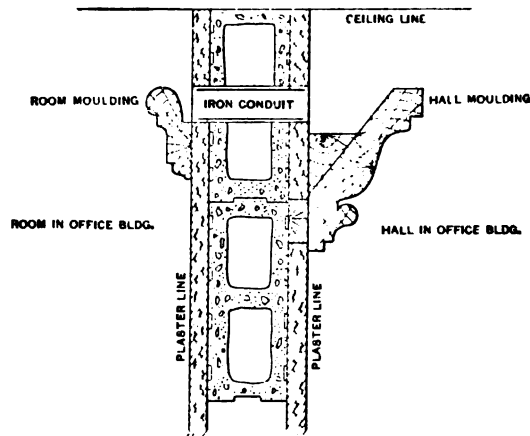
CROSS-SECTION OF PARTITION SHOWING HALL MOLDING, ROOM MOLDING AND PARTITION CONDUIT.
